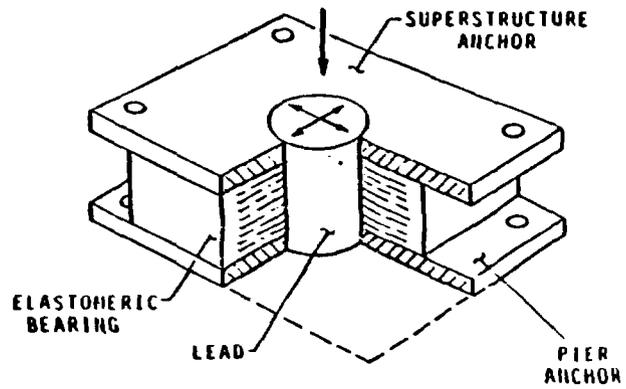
Laminated Elastomeric Bearings with Lead Plug
